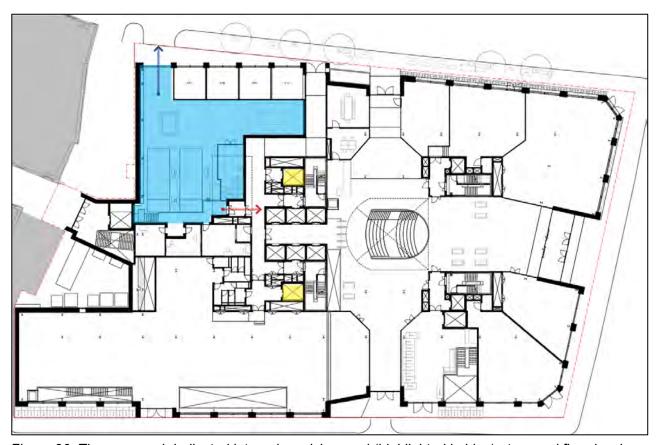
The proposed dedicated internal servicing yard (highlighted in blue) at ground floor level
